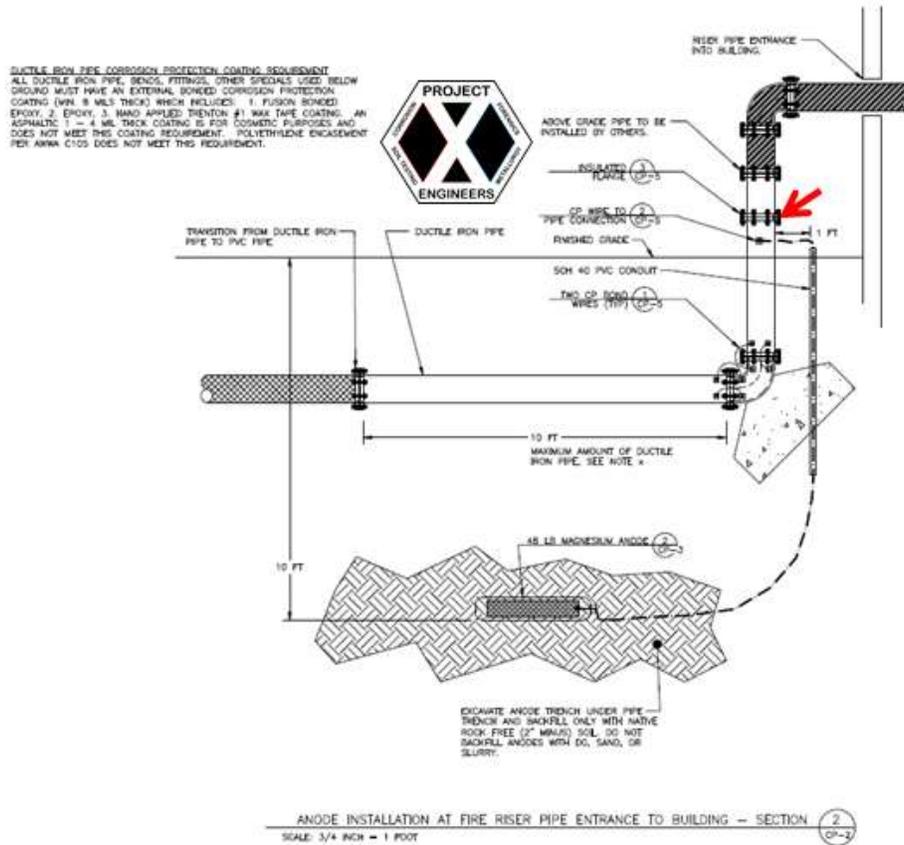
Fire Riser Detail: Install Isolation joint at red arrow
